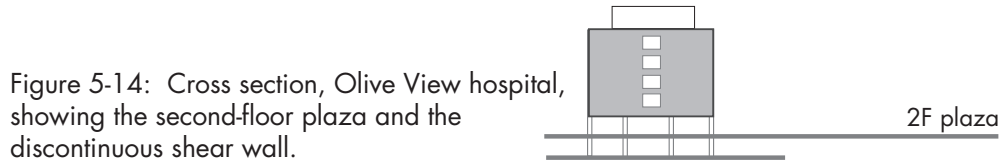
Cross section, Olive View hospital, showing the second-floor plaza and the discontinuous shear wall.
